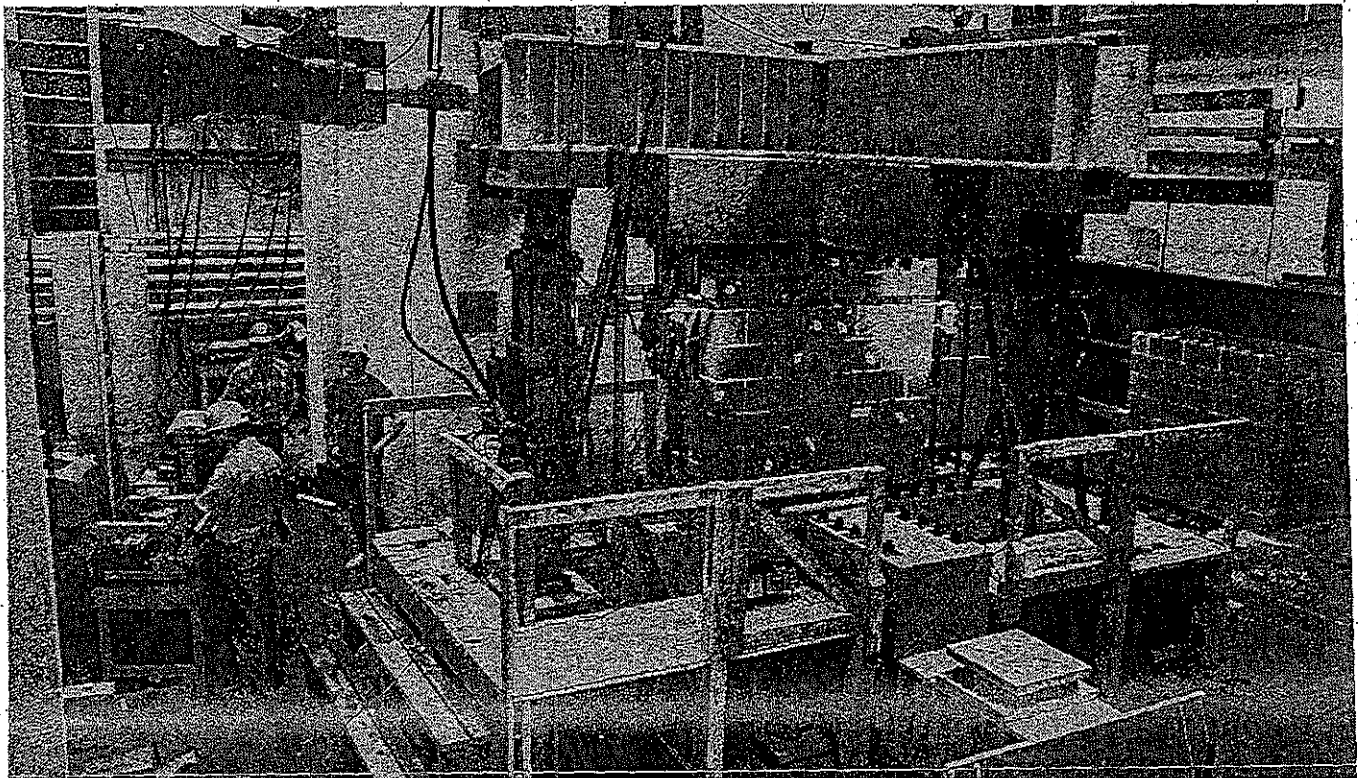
In-place 5-by-5-ft masonry block wall at NBS Tridirectional Test Facility.
